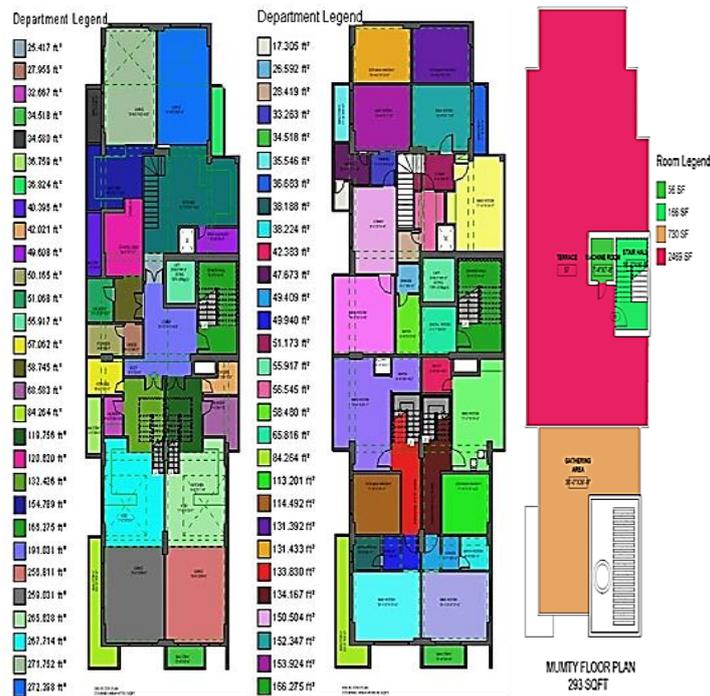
First-floor Plan 2nd-floor plan & Mumty floor
